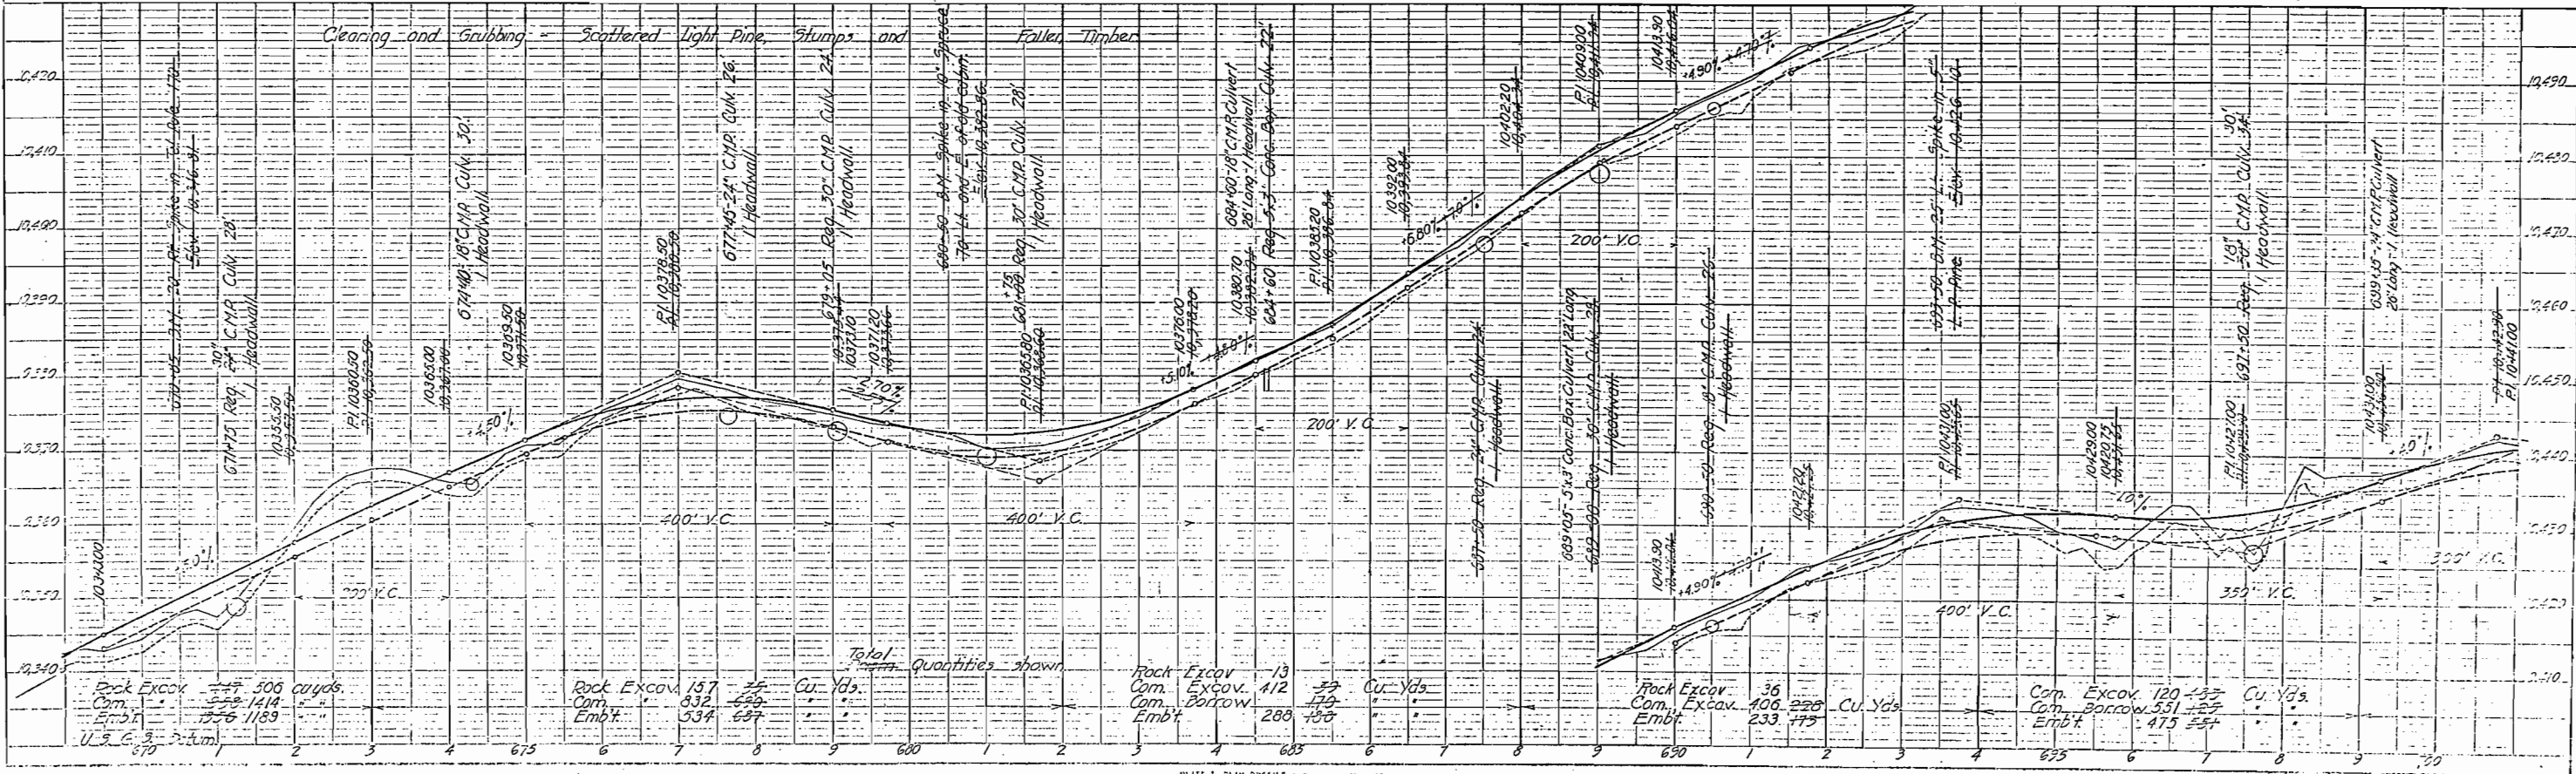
PLATE II - PLAN-PROFILE OF RIVER CONSTRUCTION
